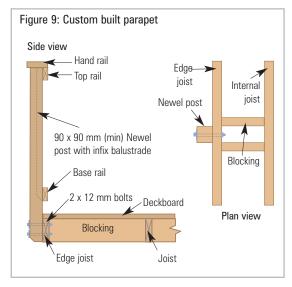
shows a typical custom-built parapet specification. It should be noted that newel posts should be fixed directly to the edge joists and the front "header" joist. All joists must be at least 45 mm wide and suitably reinforced. Typically, newel posts are secured using two 12mm through bolts with washers at both the bolt head and nut. These washers shall be three times the diameter of the bolt in size.
